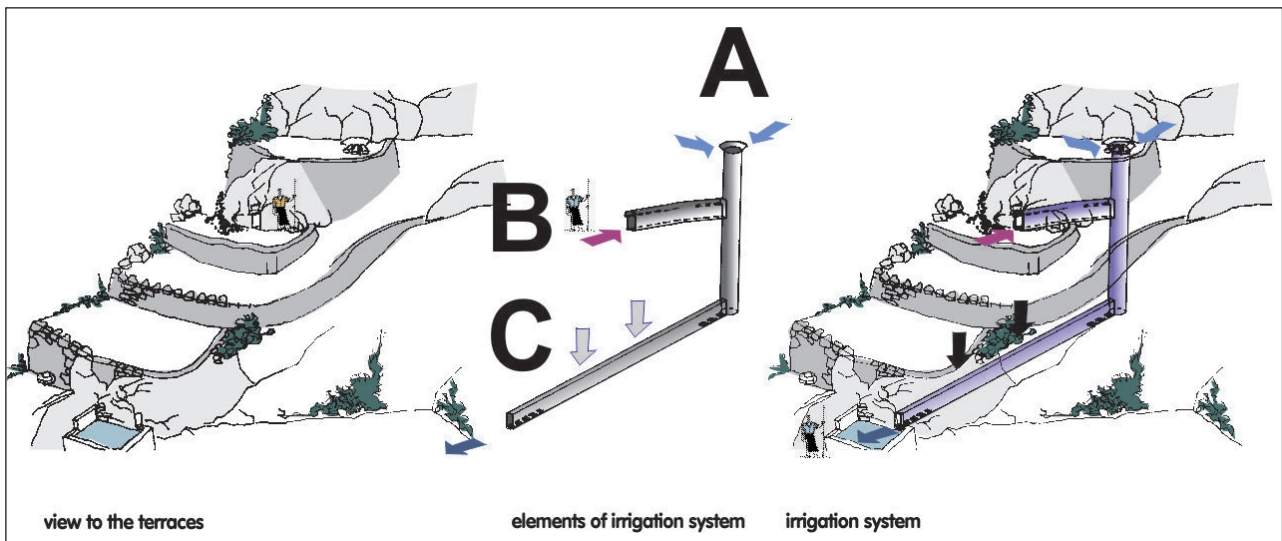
The system consists of a vertical shaft, horizontal channel and a basin. Inspection openings are on the top A, with horizontal tunnel B and holes in the terrain C.
